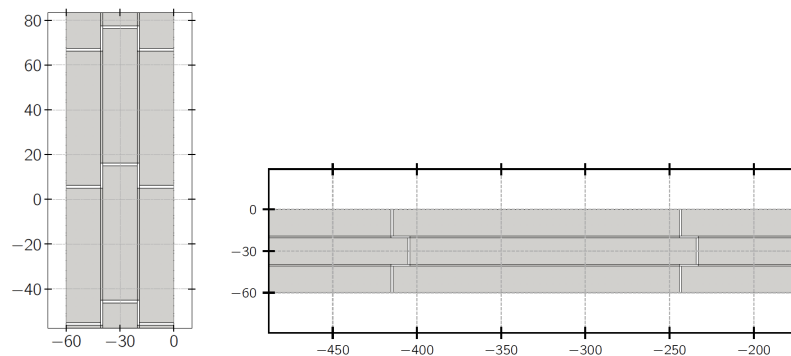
(Left) Vertical and (Right) horizontal cuts on a single wall showing the arrangement of bricks with a nominal gap of 15 mm.
